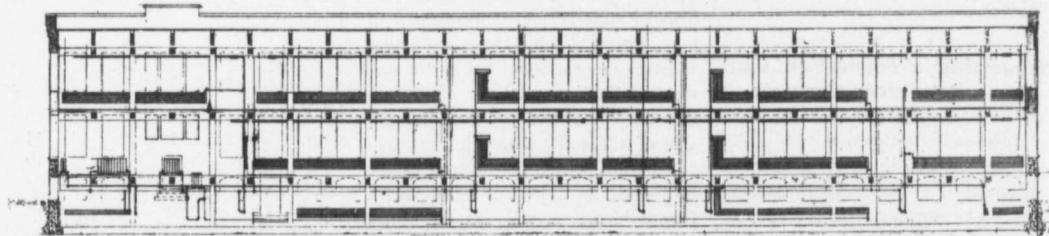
LONGITUDINAL SECTION OF MAIN BUILDING LOOKING SOUTH.
